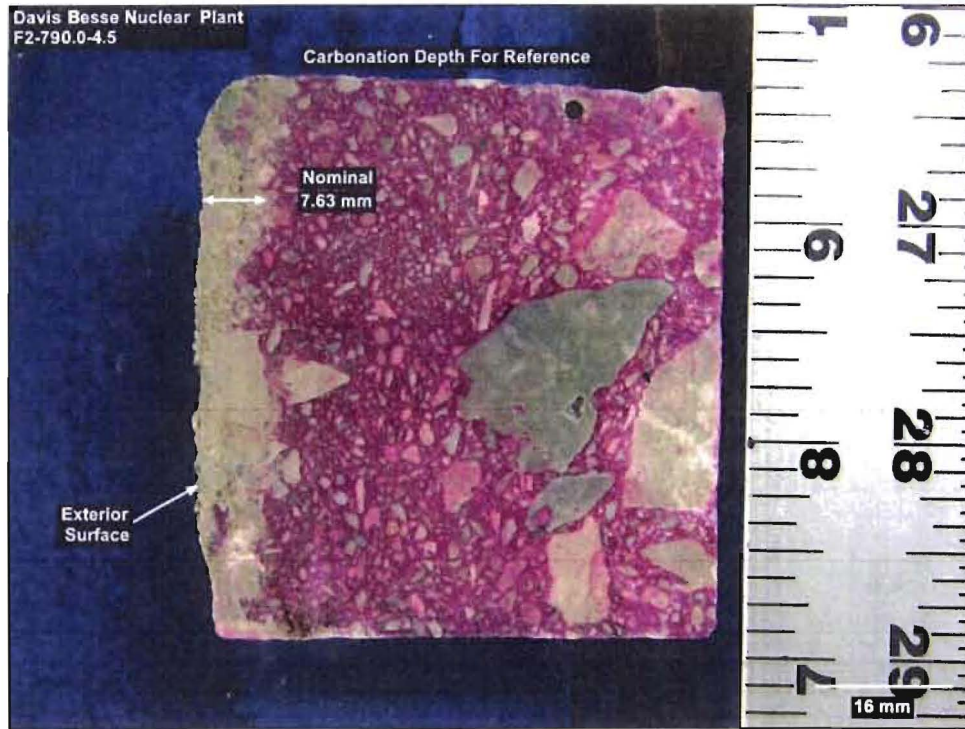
Fracture Sample with Carbonation Layer (Core F2-790.0-4.5)
